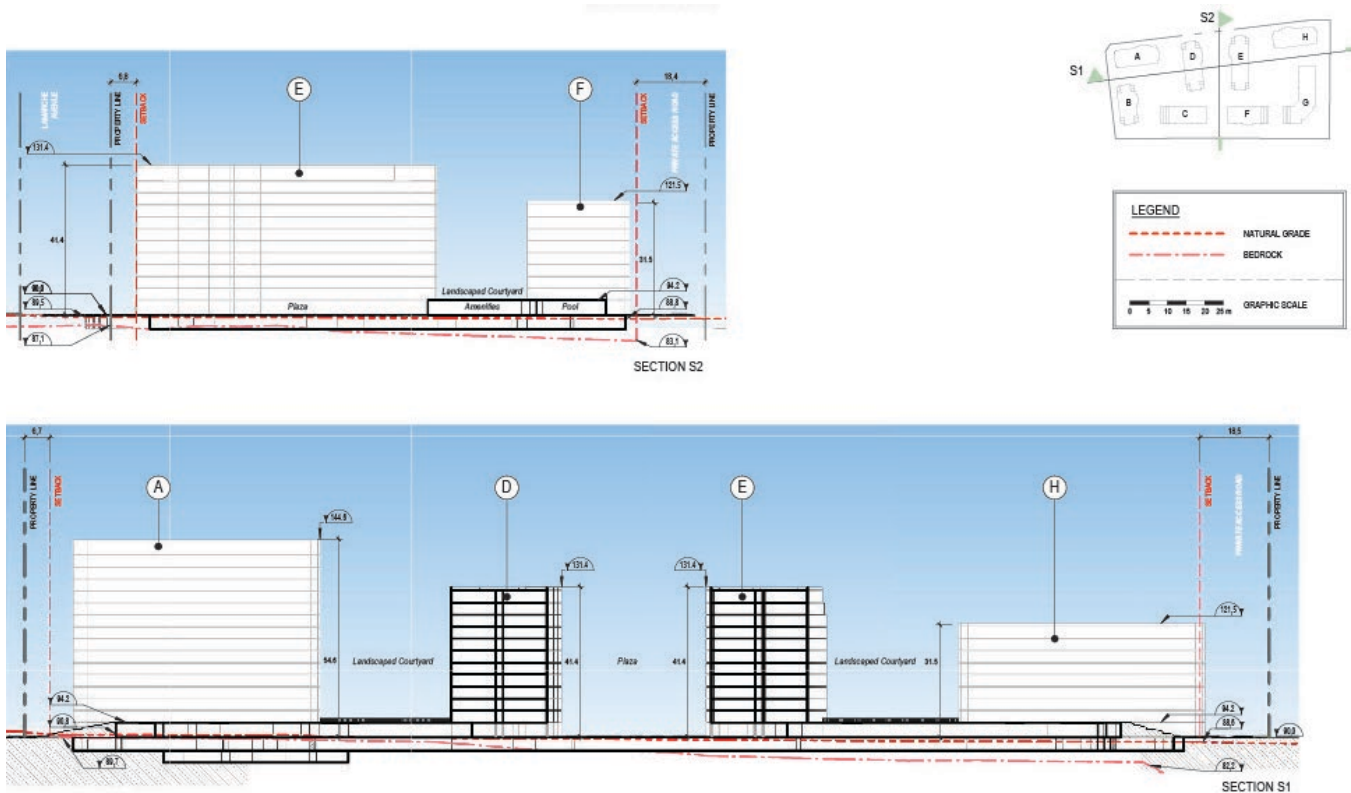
Cross-Sections Illustrating Proposed Building Elevations
